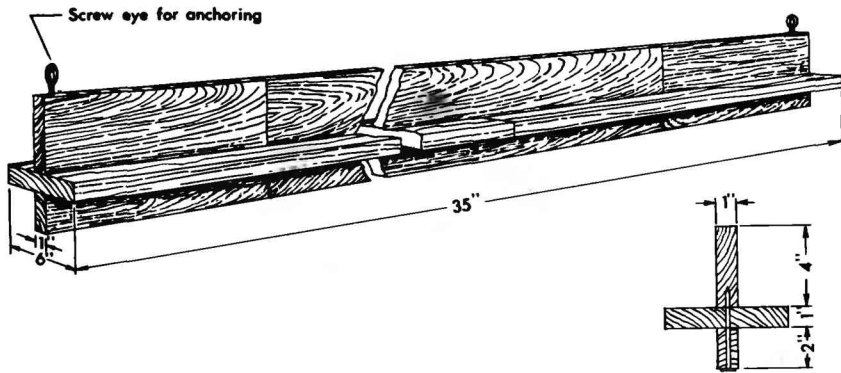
Construction of baffle used to subdue wind action in settling basin.
